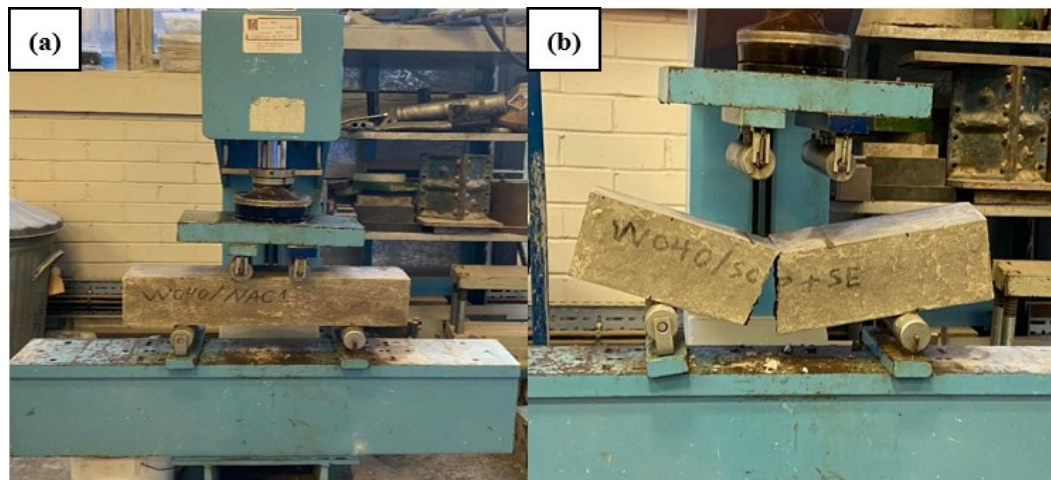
(a) flexural strength test, (b) flexural failure of prismatic concrete beam
